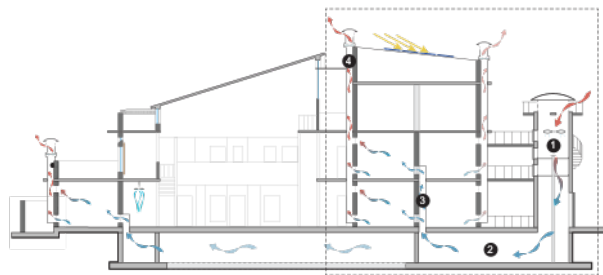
Building design intent. (1) Inlet wind tower with desiccant trays, (2) Earth duct, (3) Inlet shafts to rooms, (4) Exhaust solar chimneys.
